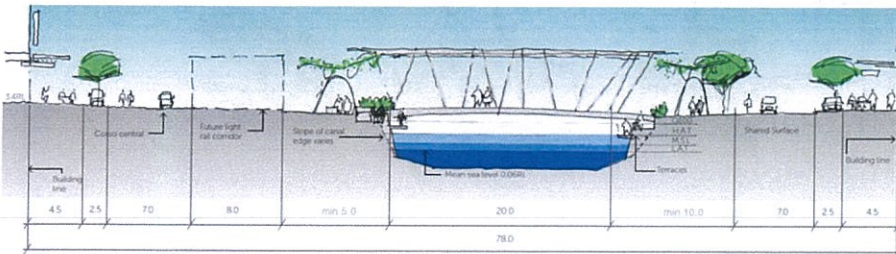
Corso Esplanade (between Main Street Boulevard and Town Centre Boulevard) (Looking East)
